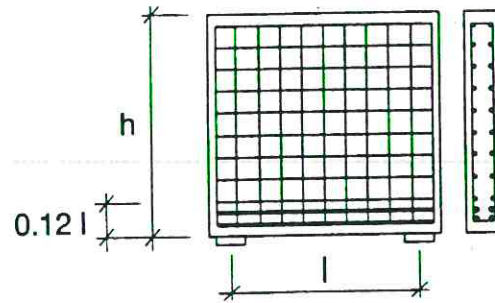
Distribution of longitudinal reinforcement in a deep beam
